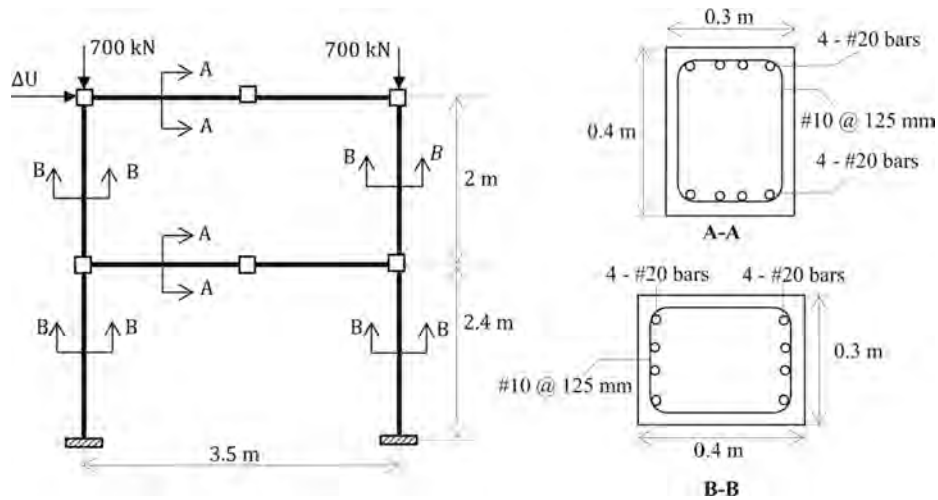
Geometry, loading arrangement, and cross-sectional details of Vecchio and Emara (1992) frame [42].
